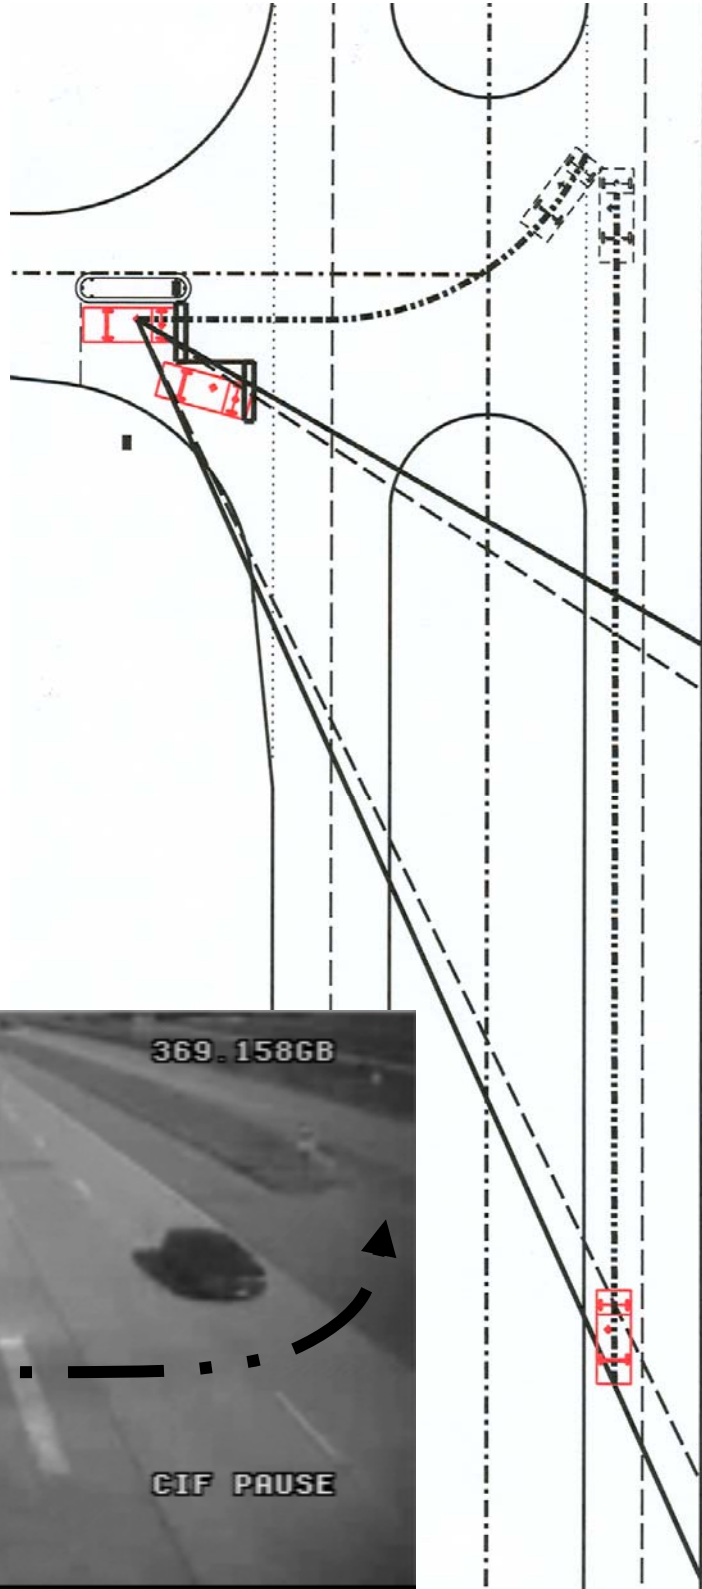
Plan View of Proposed Staggered Stop Bar Pavement Marking to Better Fit Driver Behavior at MLA-Type Intersections
